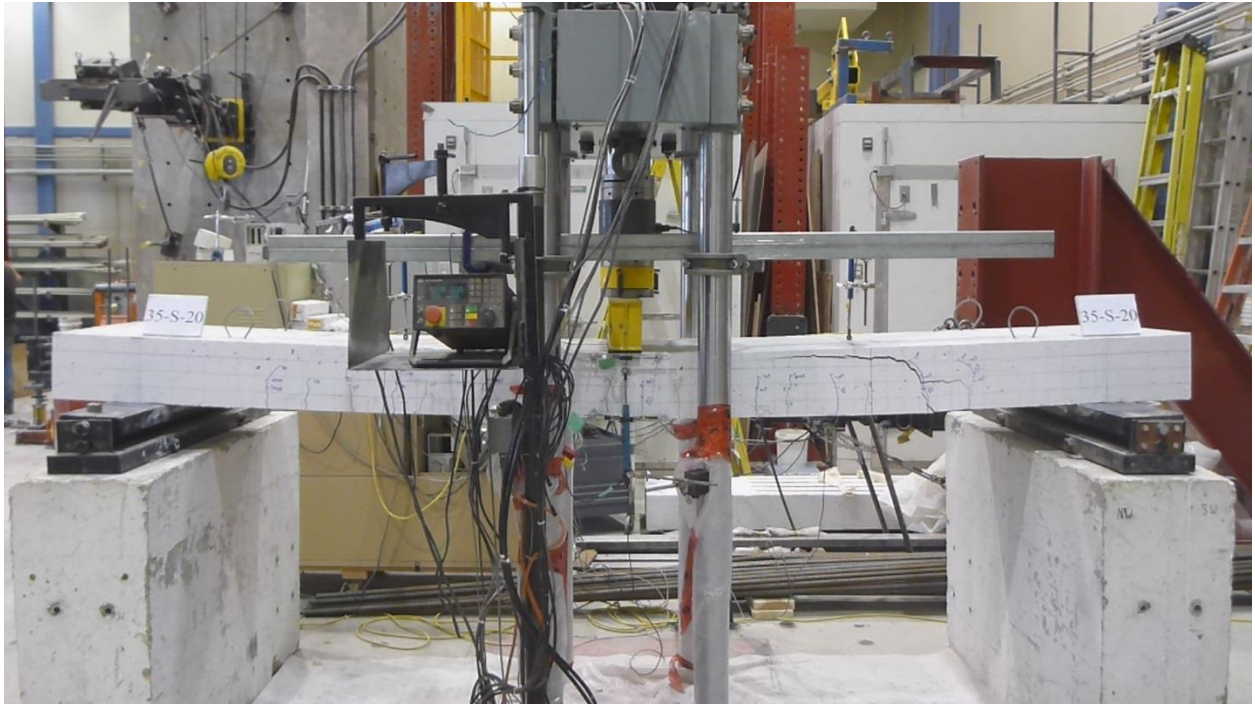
Modes of Failure and Condition of Slab SP-S-20 at Failure
